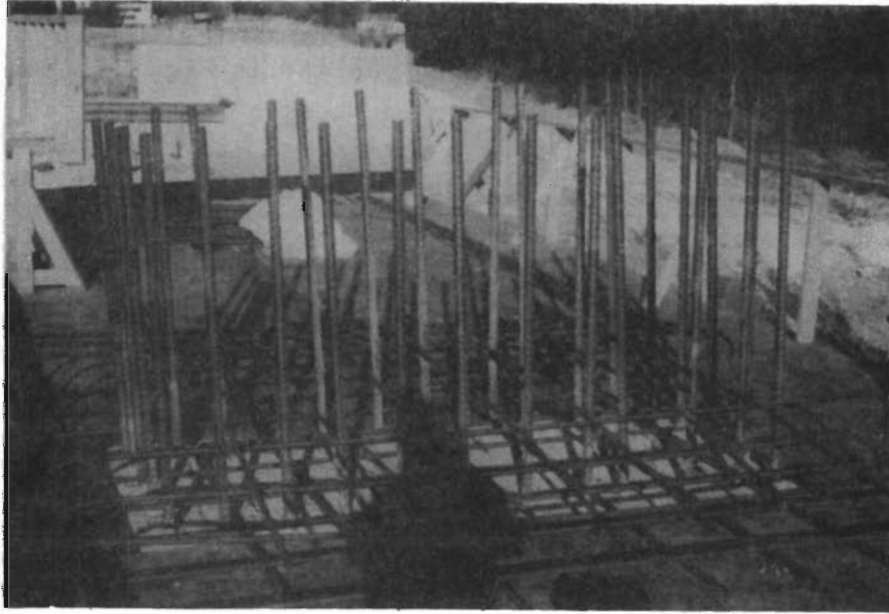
Steel extending up from the center pier to provide continuity between the pier and the cast-in-place pier cap
